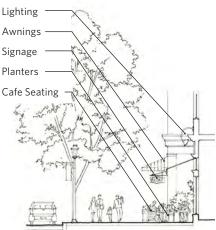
Examples of street furniture and other elements that enhance a building storefront.
